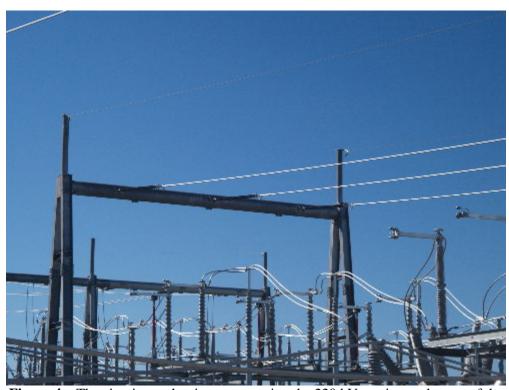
Overview of the substation site as of April 1, 2005. Only limited work was occurring on the substation site during the site visit.
